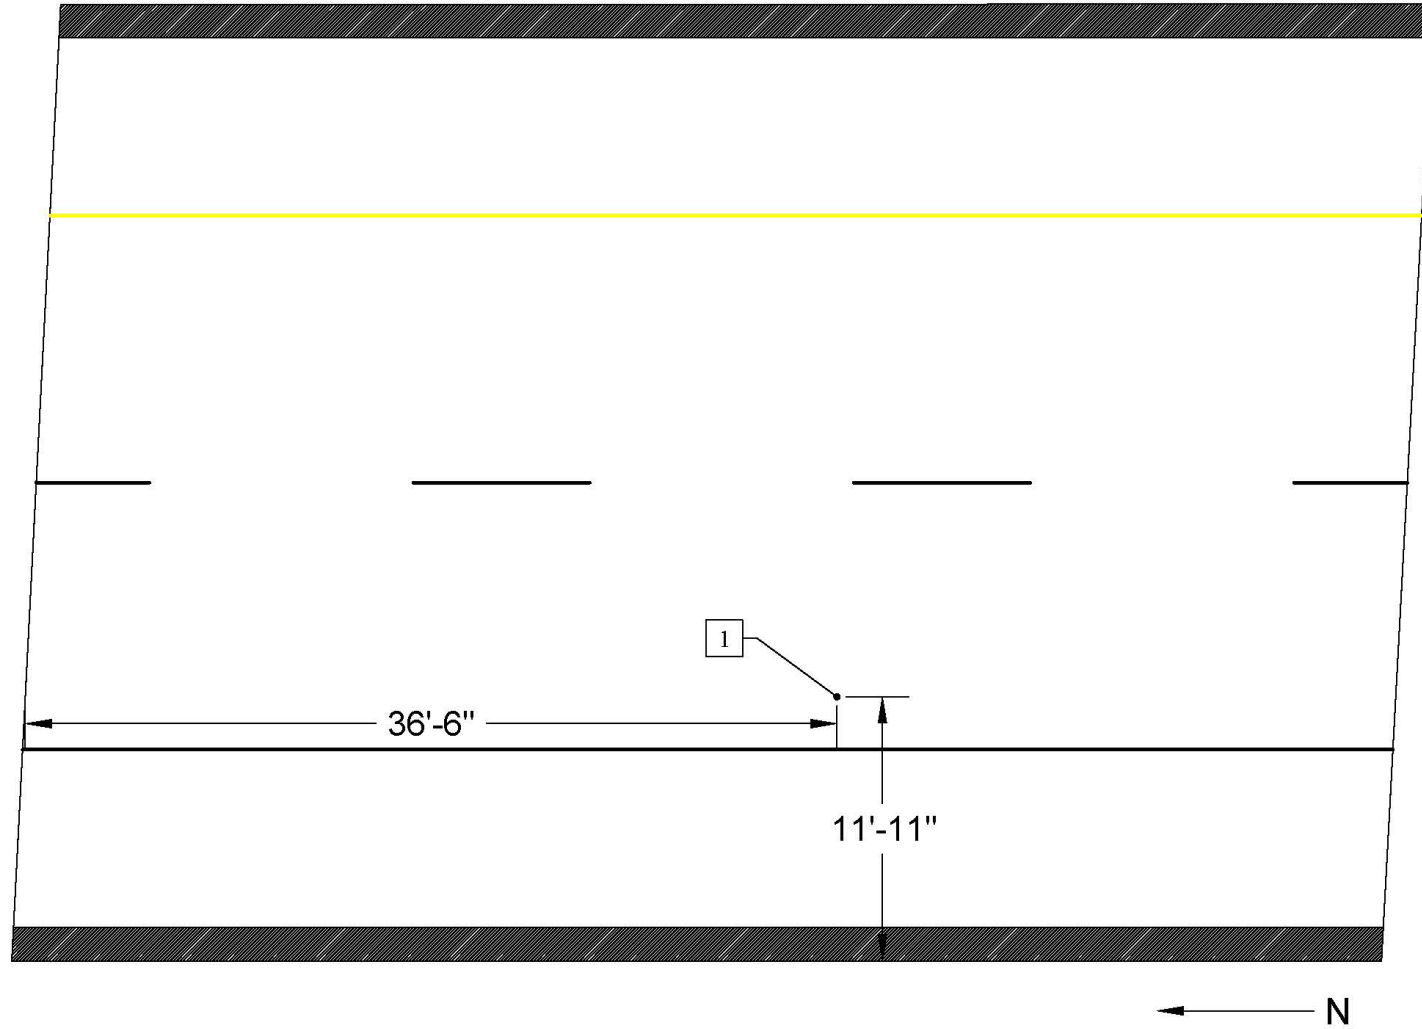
to A-8 show the location of the sensors installed in the bridge decks prior to construction. Figures A-9 to A-12 show the locations where concrete used for beam and cylindrical specimens was sampled during construction. Figures A-13 to A-16 show the approximate locations where concrete cover depth measurements, Schmidt rebound hammer testing, and chloride concentration sampling were performed. For chloride concentration testing, successive tests at a given location were performed 1 ft from the previous test, measured longitudinally in the direction of traffic.
